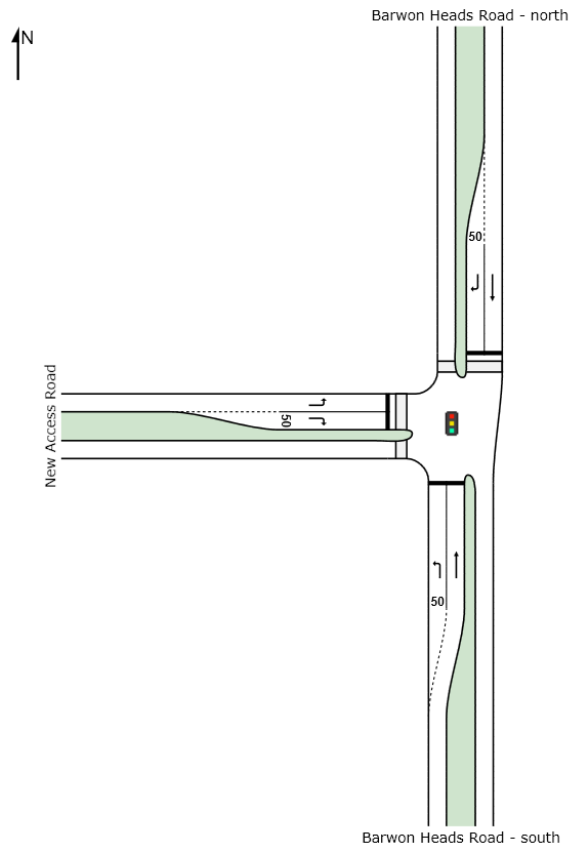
Proposed Barwon Heads Road/ New Access Road intersection- single carriageway
